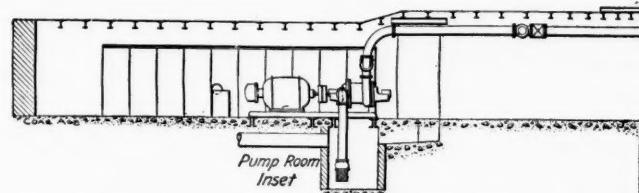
SECTIONAL ELEVATION ON CD (FIG. 2)
